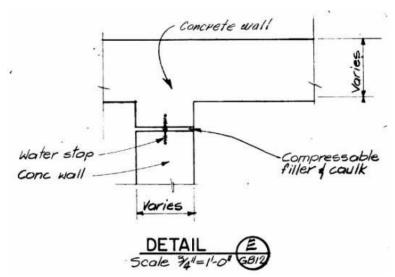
Wall Joint Detail (from Sheet GB-12, 44 of 190, 1982 construction drawings)
